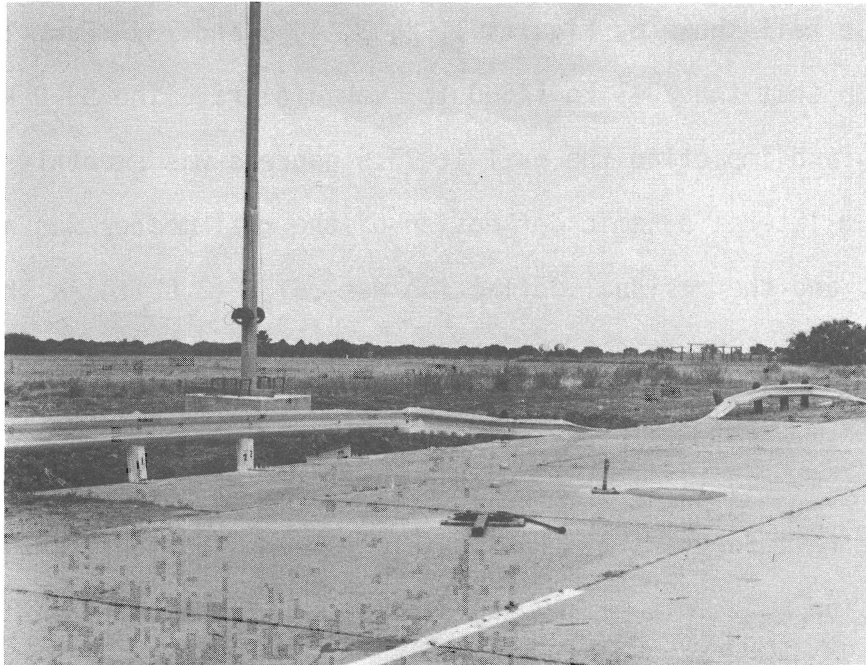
Closeup of Bridge Rail Damage after Test 1A.
